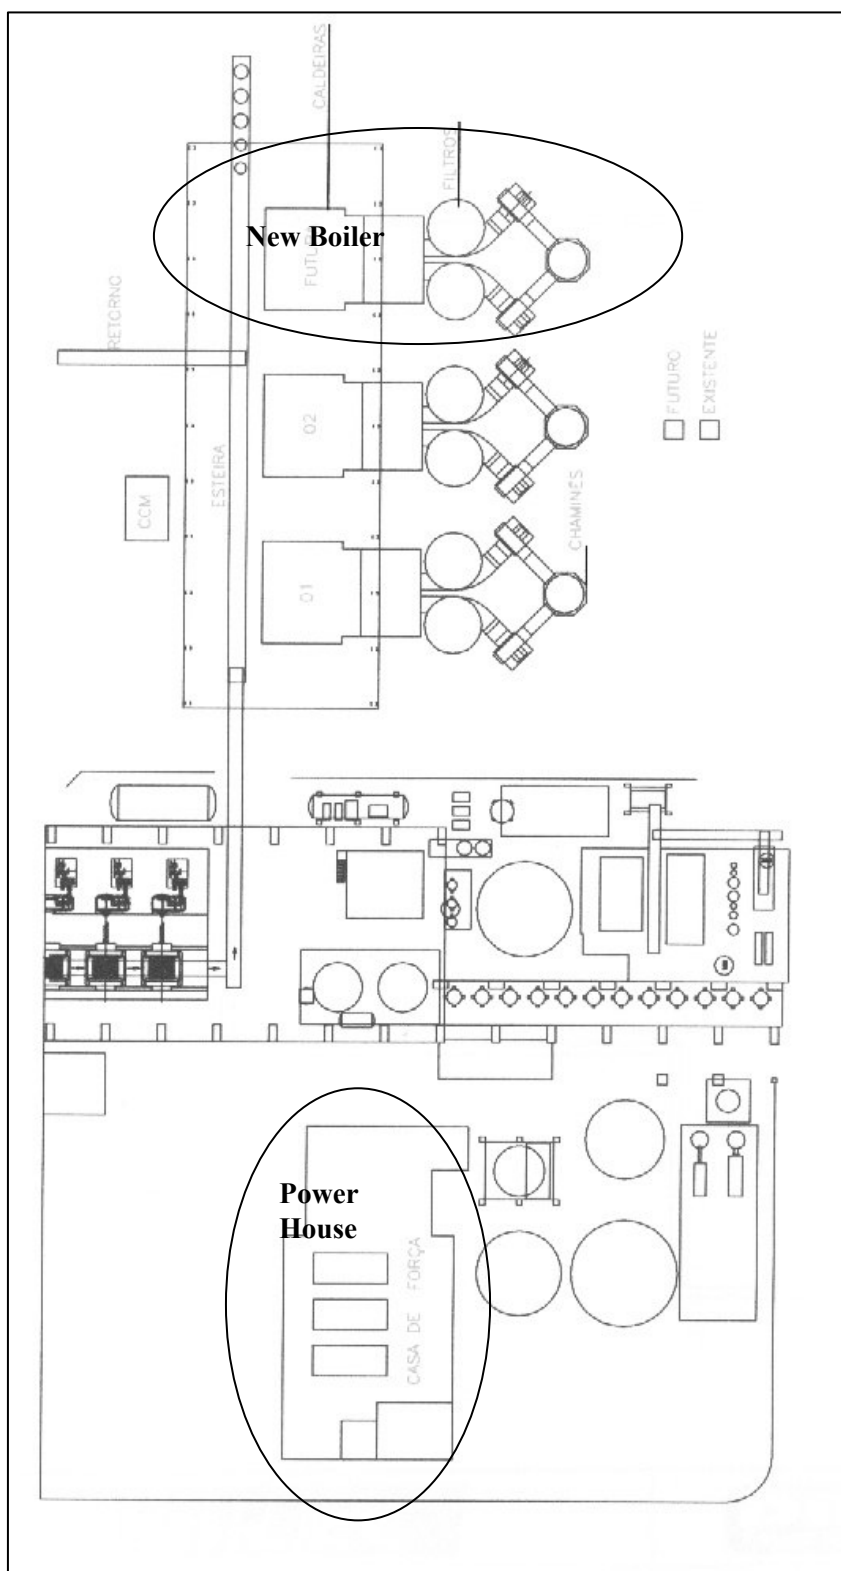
Location of installed equipments for bagasse cogeneration at Jalles Machado with new boiler
